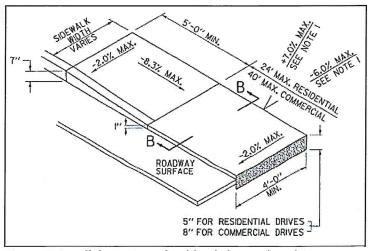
Parallel crossings should only be used on driveways that slope downhill from the street and care should be taken to avoid excessive cross slopes.
